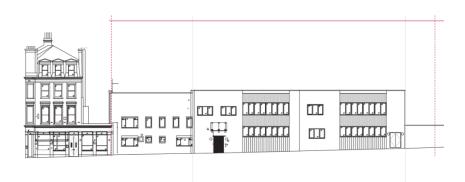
33 Jamestown Road, Building B and Jamestown Road Building C
